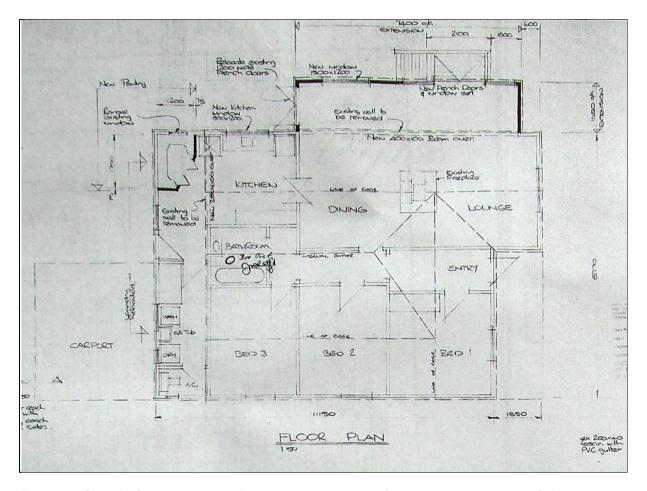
Small's Cottage current floorplan 2017, drawn for renovation in 1986. Orientated with the western wall to the top of the plan.
